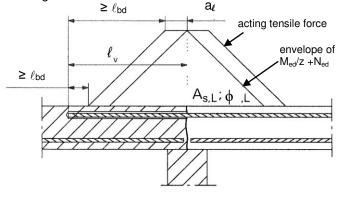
Overlapping joint at a foundation of a wall or column where the rebars are stressed in tension
